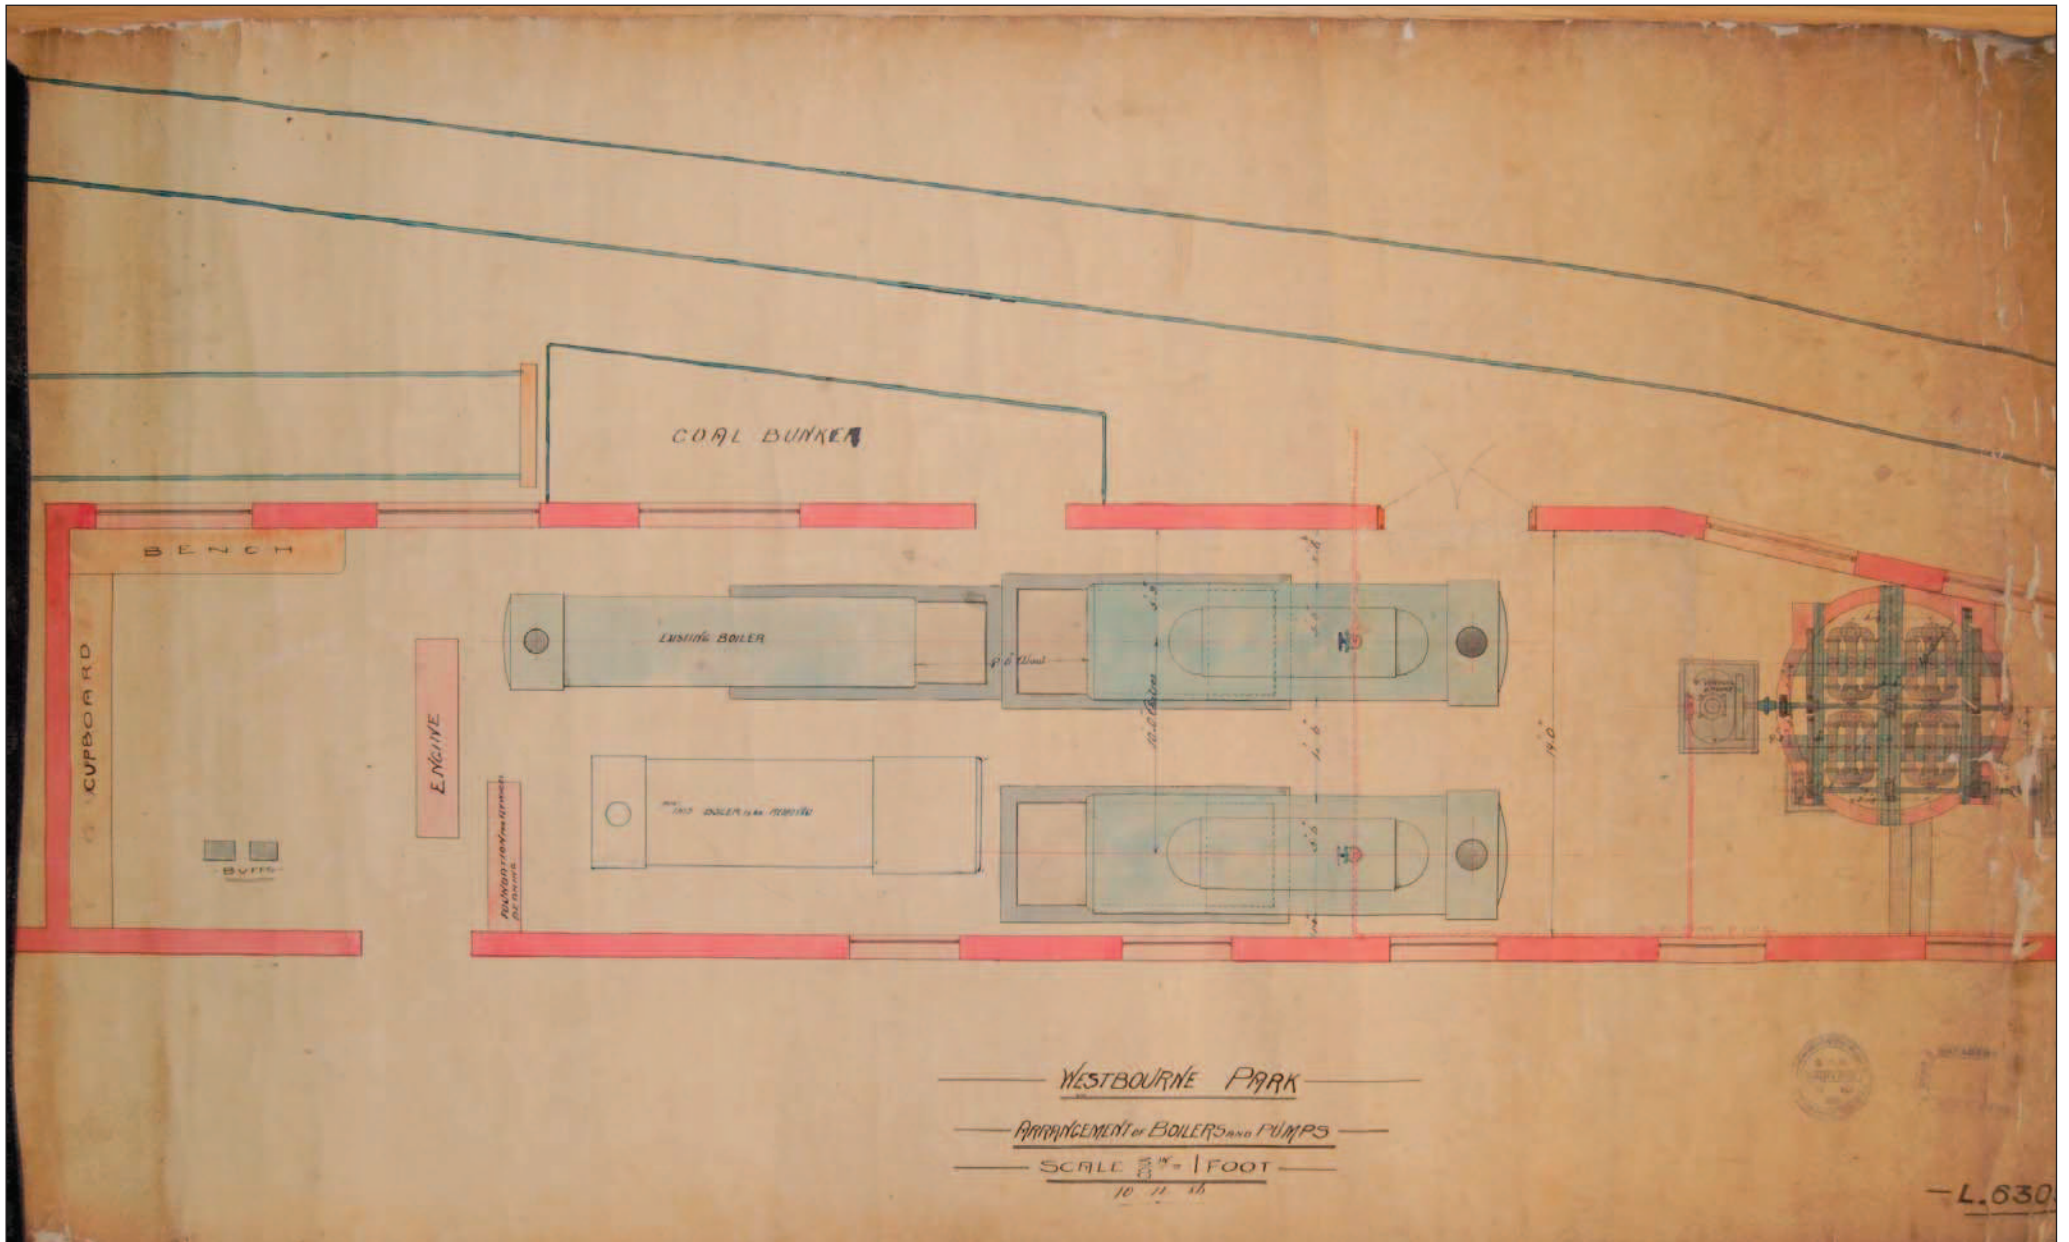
1886 Workshop engine, boiler and pump room proposal plan
